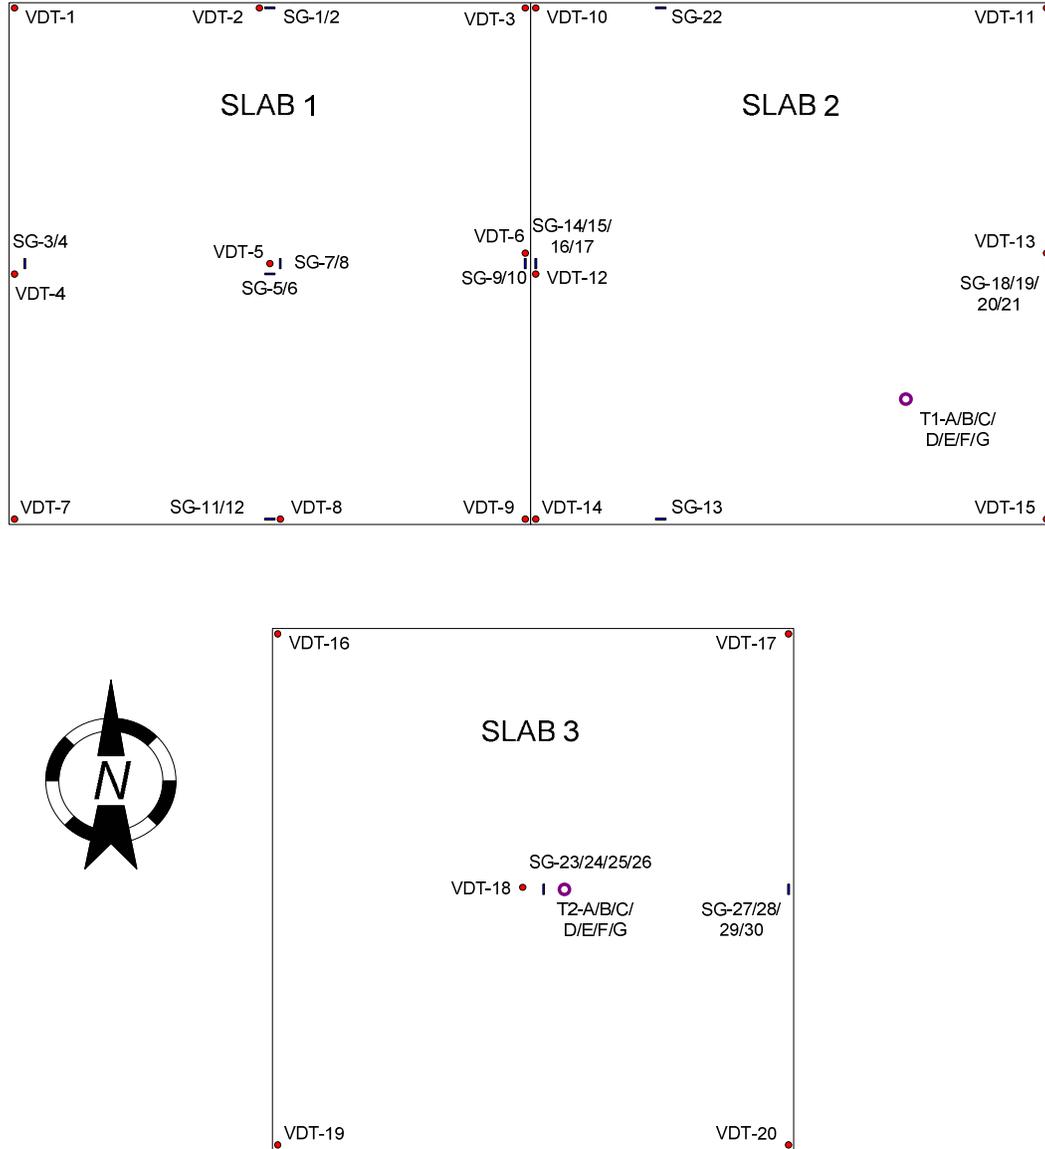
Sensor Layout in Taxiway E Instrumented Slabs.
